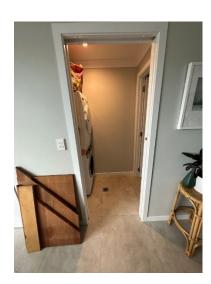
Ground floor WC separated from kitchen, dining and lounge by additional door, accessed
